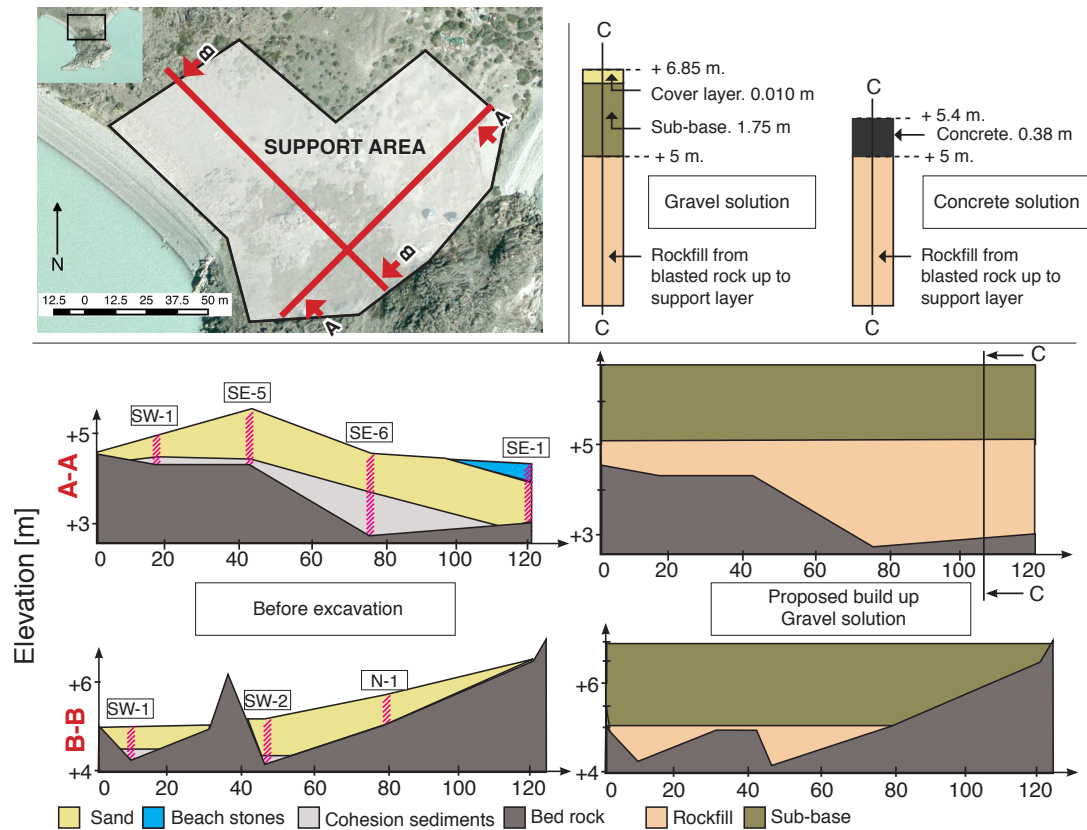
Overview of support area and cross sections illustrating suggested designs.
